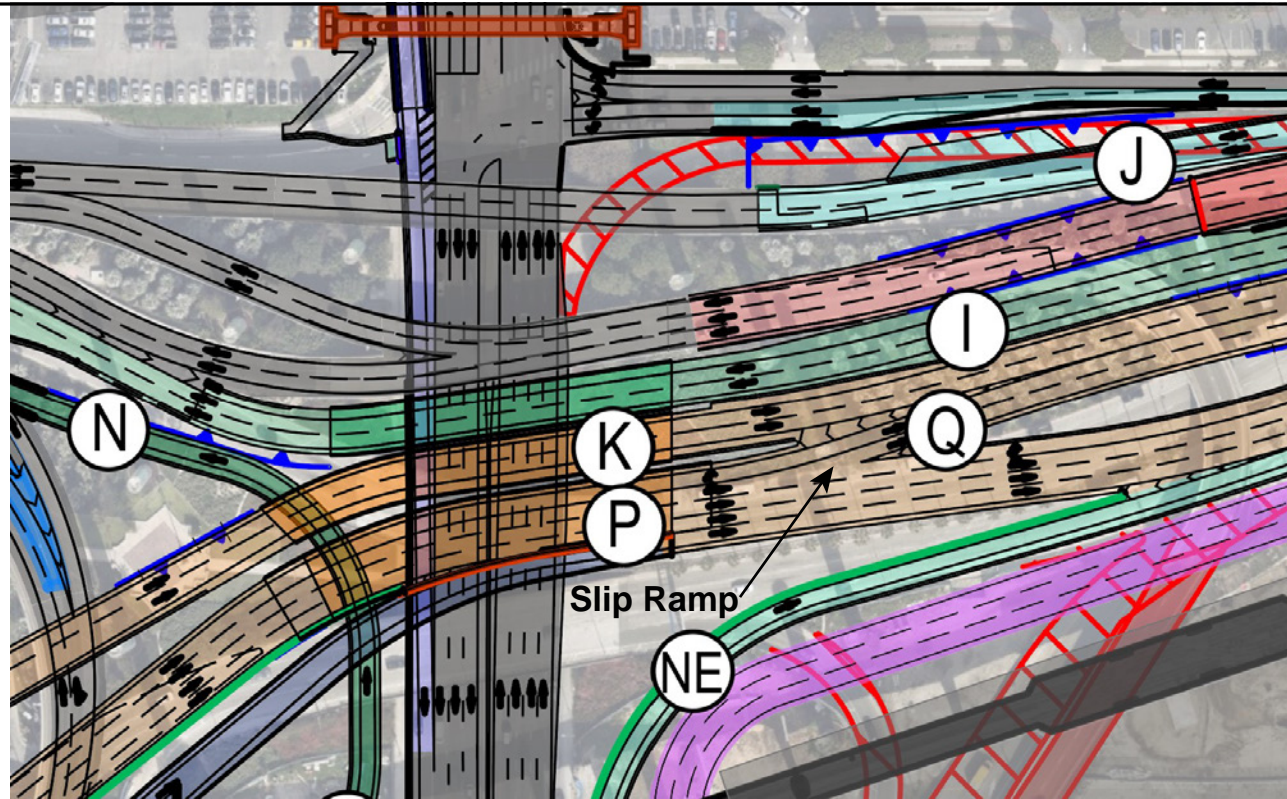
Instead of a weaving section between Segments K and P, a slip ramp would be added between Segments K and P and the weaving section would be removed.
